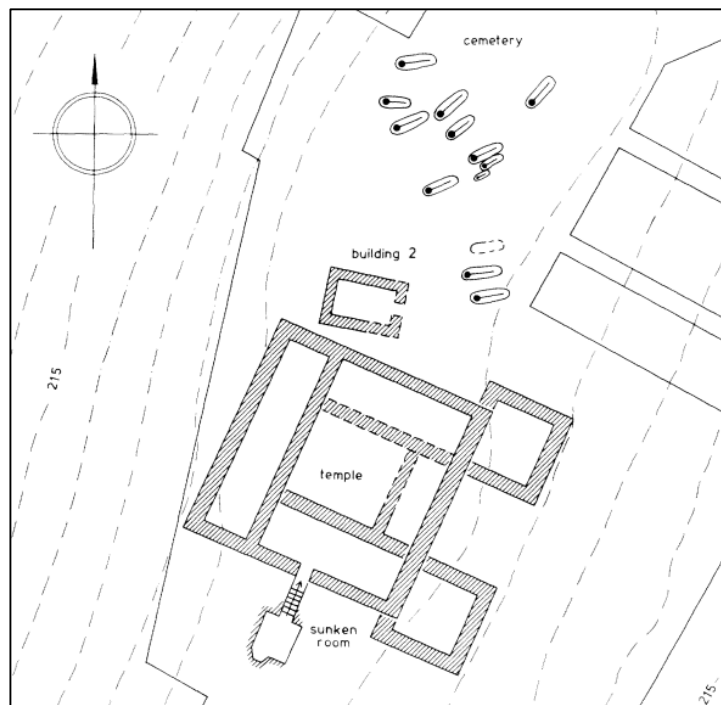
Lamyatt Beacon temple plan (Leech et al 1986, 263)<sup>6</sup>
